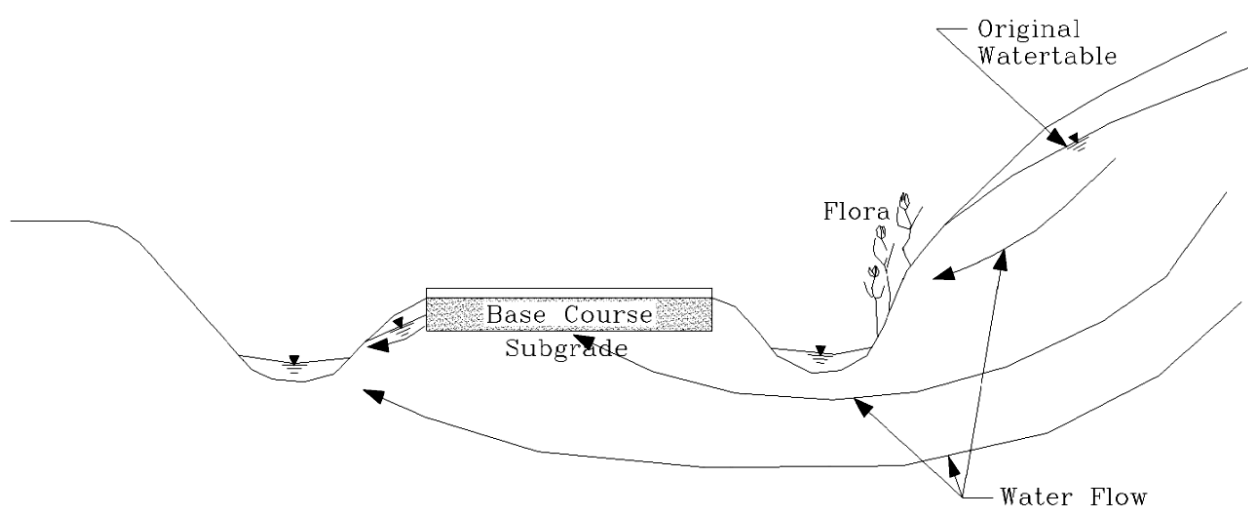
Lateral (gravity) flow of groundwater towards the roadway.
